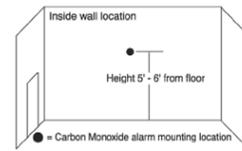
Recommended CO alarm wall mounting location is 5 to 6 feet from floor
